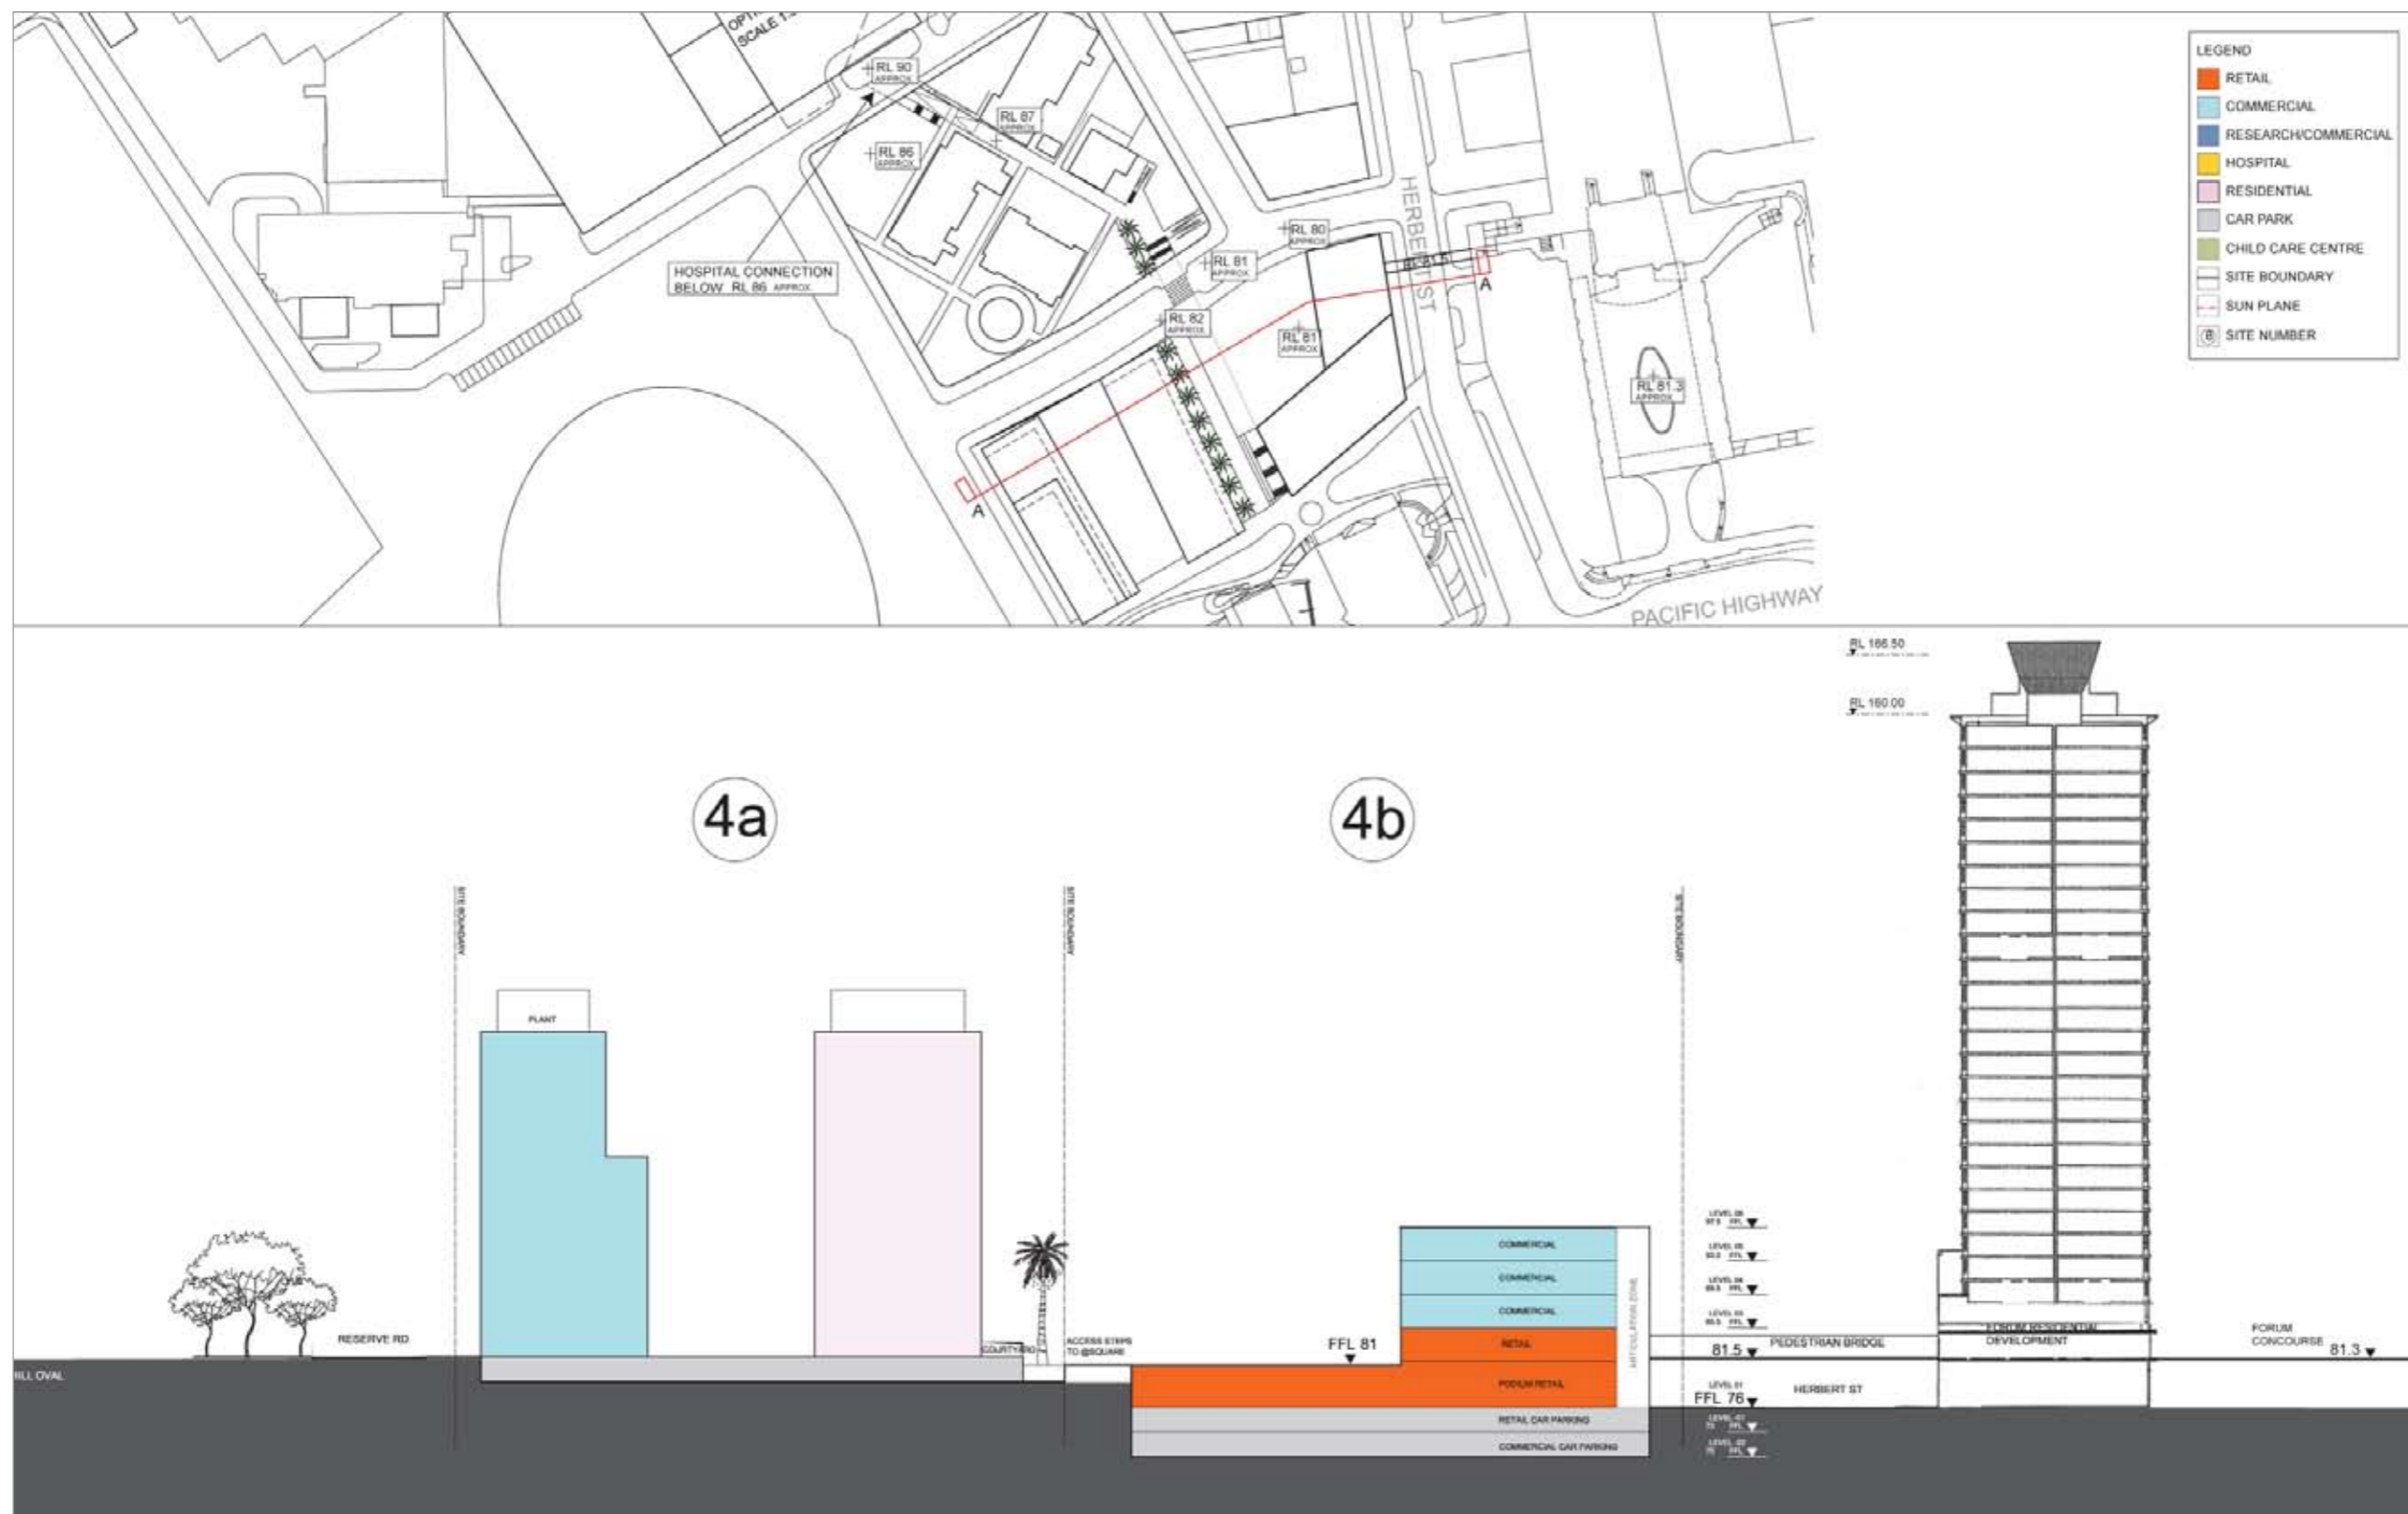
Section through Herbert Street Pedestrian Bridge, Precinct 4 Plaza and the Eilea Street pedestrian tunnel
